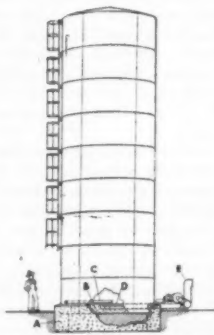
SCHEMATIC VIEW OF CROP-STORAGE UNIT AND UNLOADING MACHINE
